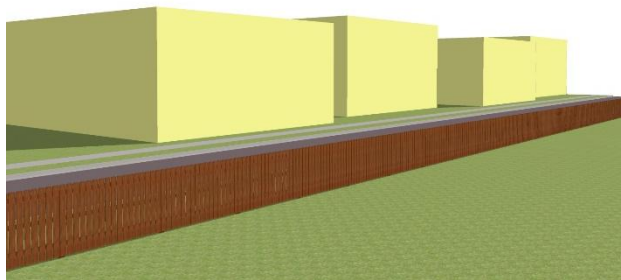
Appropriate example of a broken wall plane adjacent to a residential area.
